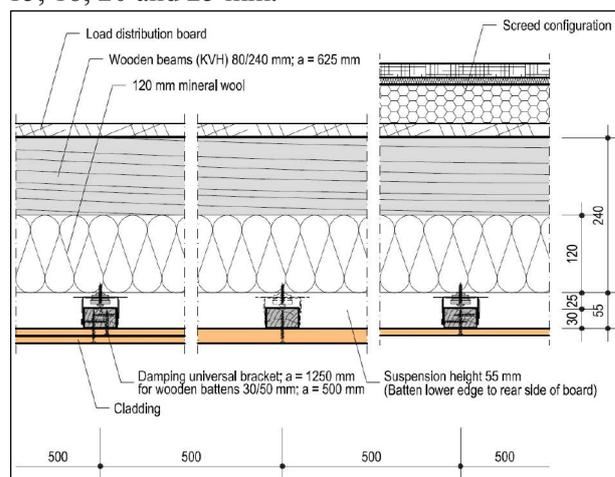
Basic ceiling, cross section parallel to the joists. Screed and lower claddings shown are examples.
